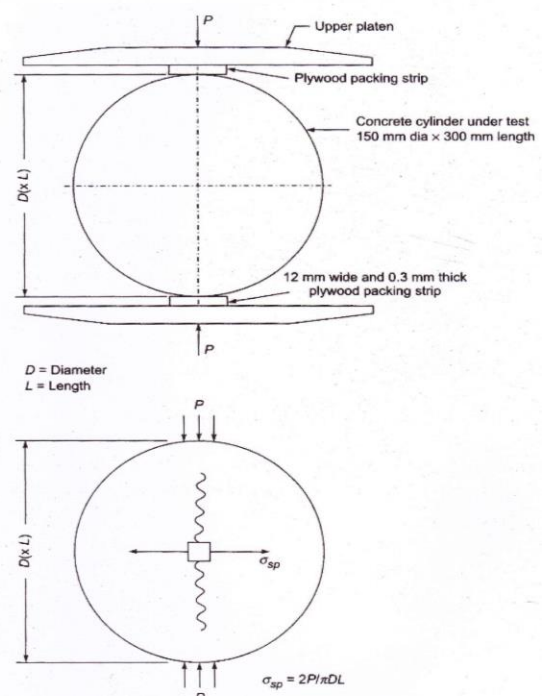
Loading setup for determination of splitting tensile strength of concrete
